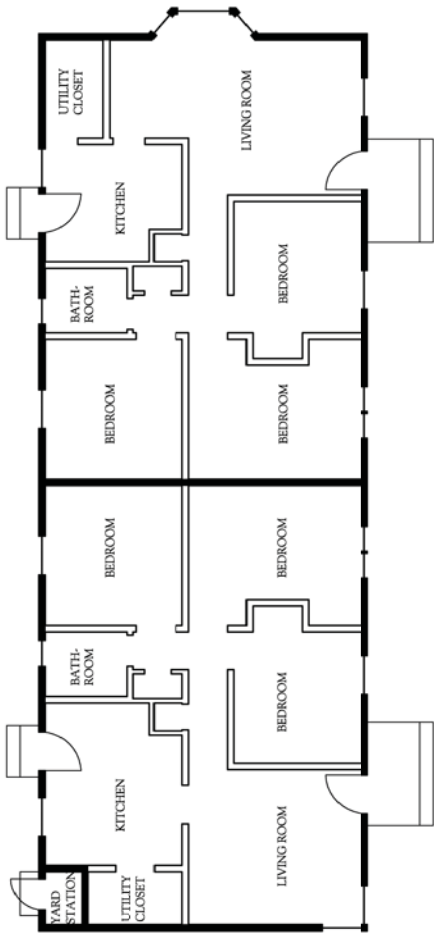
Floor plan of Residential Unit Type 3 (not to scale).
